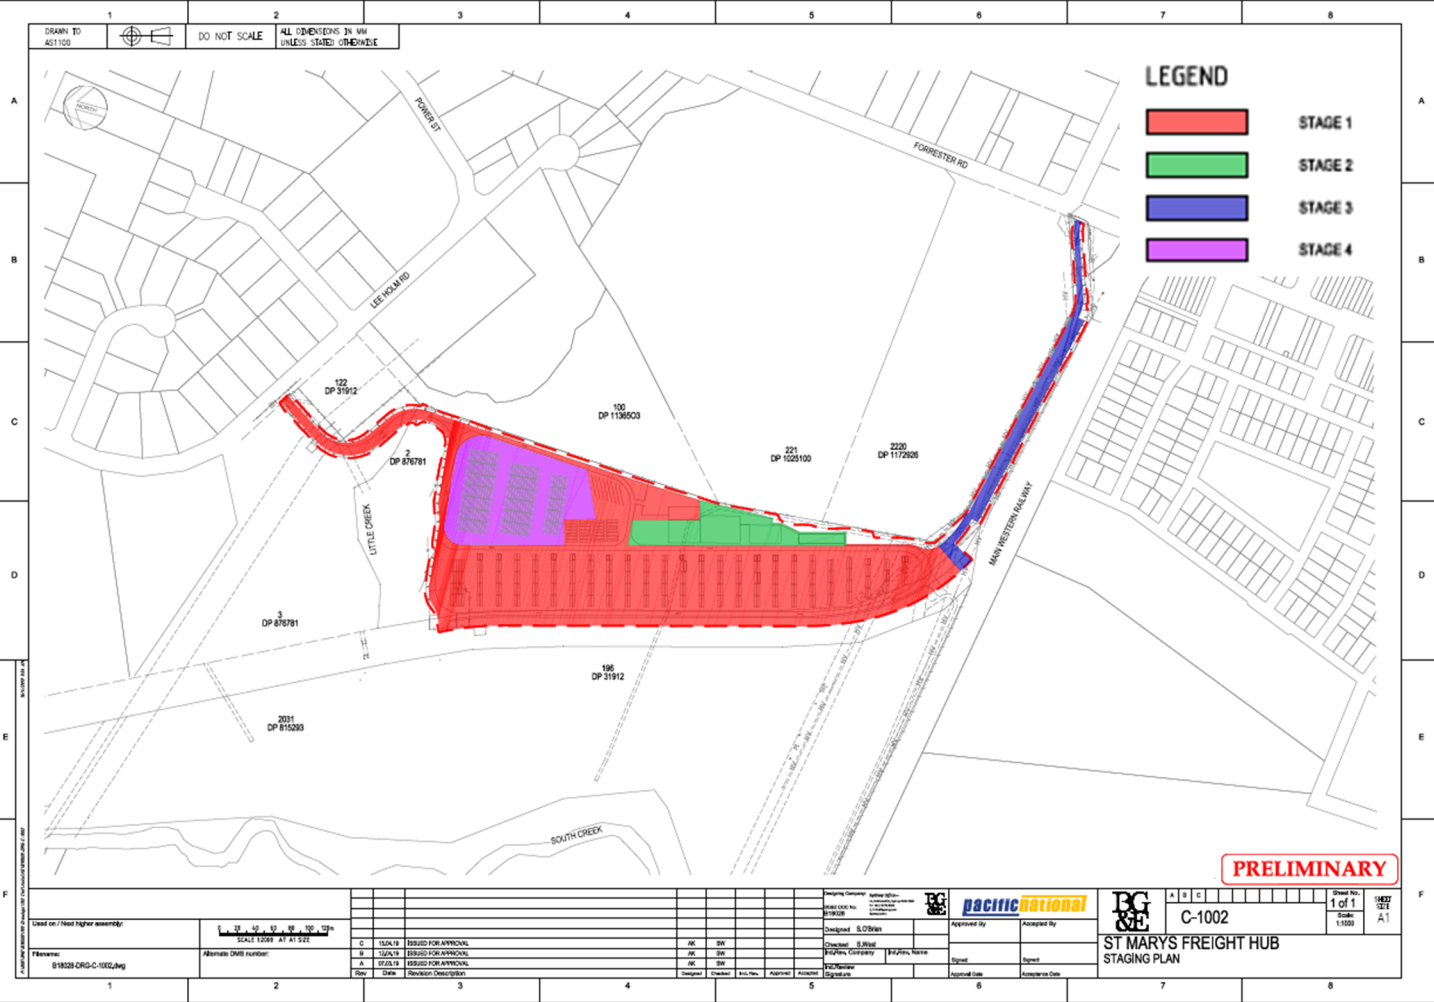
EXHIBITED – CONSTRUCTION STAGING PLAN
